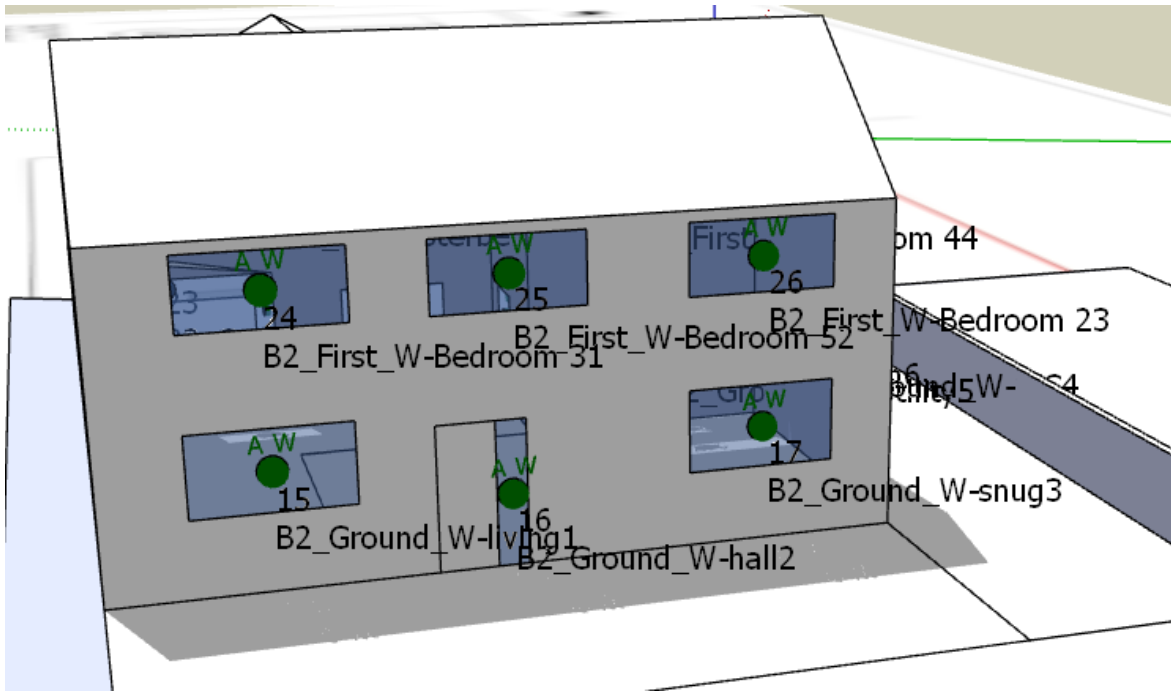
Surrounding Buildings B2-windows to be assessed – Front elevation of 12 St Michaels Mount
